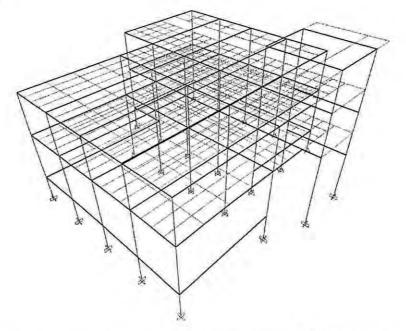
3D view of the FE model of a typical cyclone shelter funded by the European Union (without bracing)
